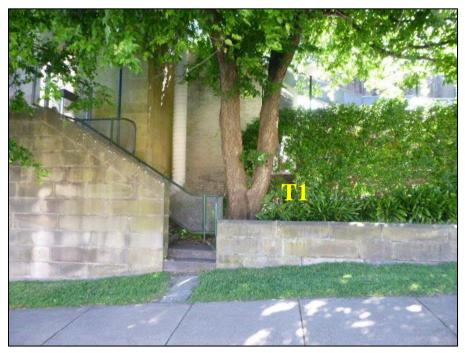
Tree impacted upon by demolition of existing structures and construction associated with the new development
